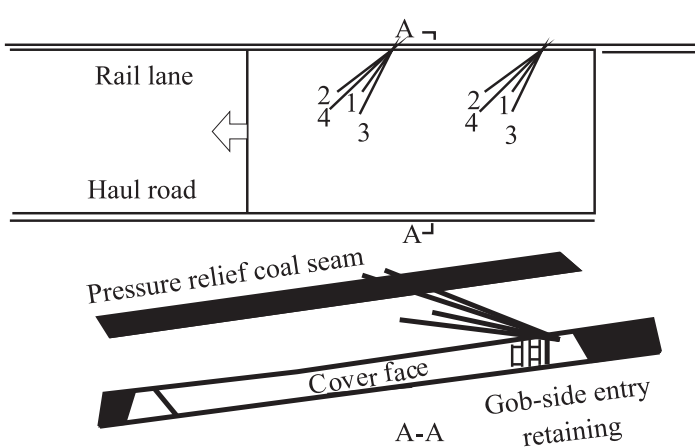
The drilling arrangement method in gob-side entry retaining drainage of coal bed methane
